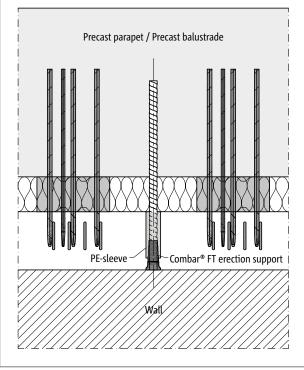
Schöck Combar® FT erection support: Installation in a precast concrete parapet; view
